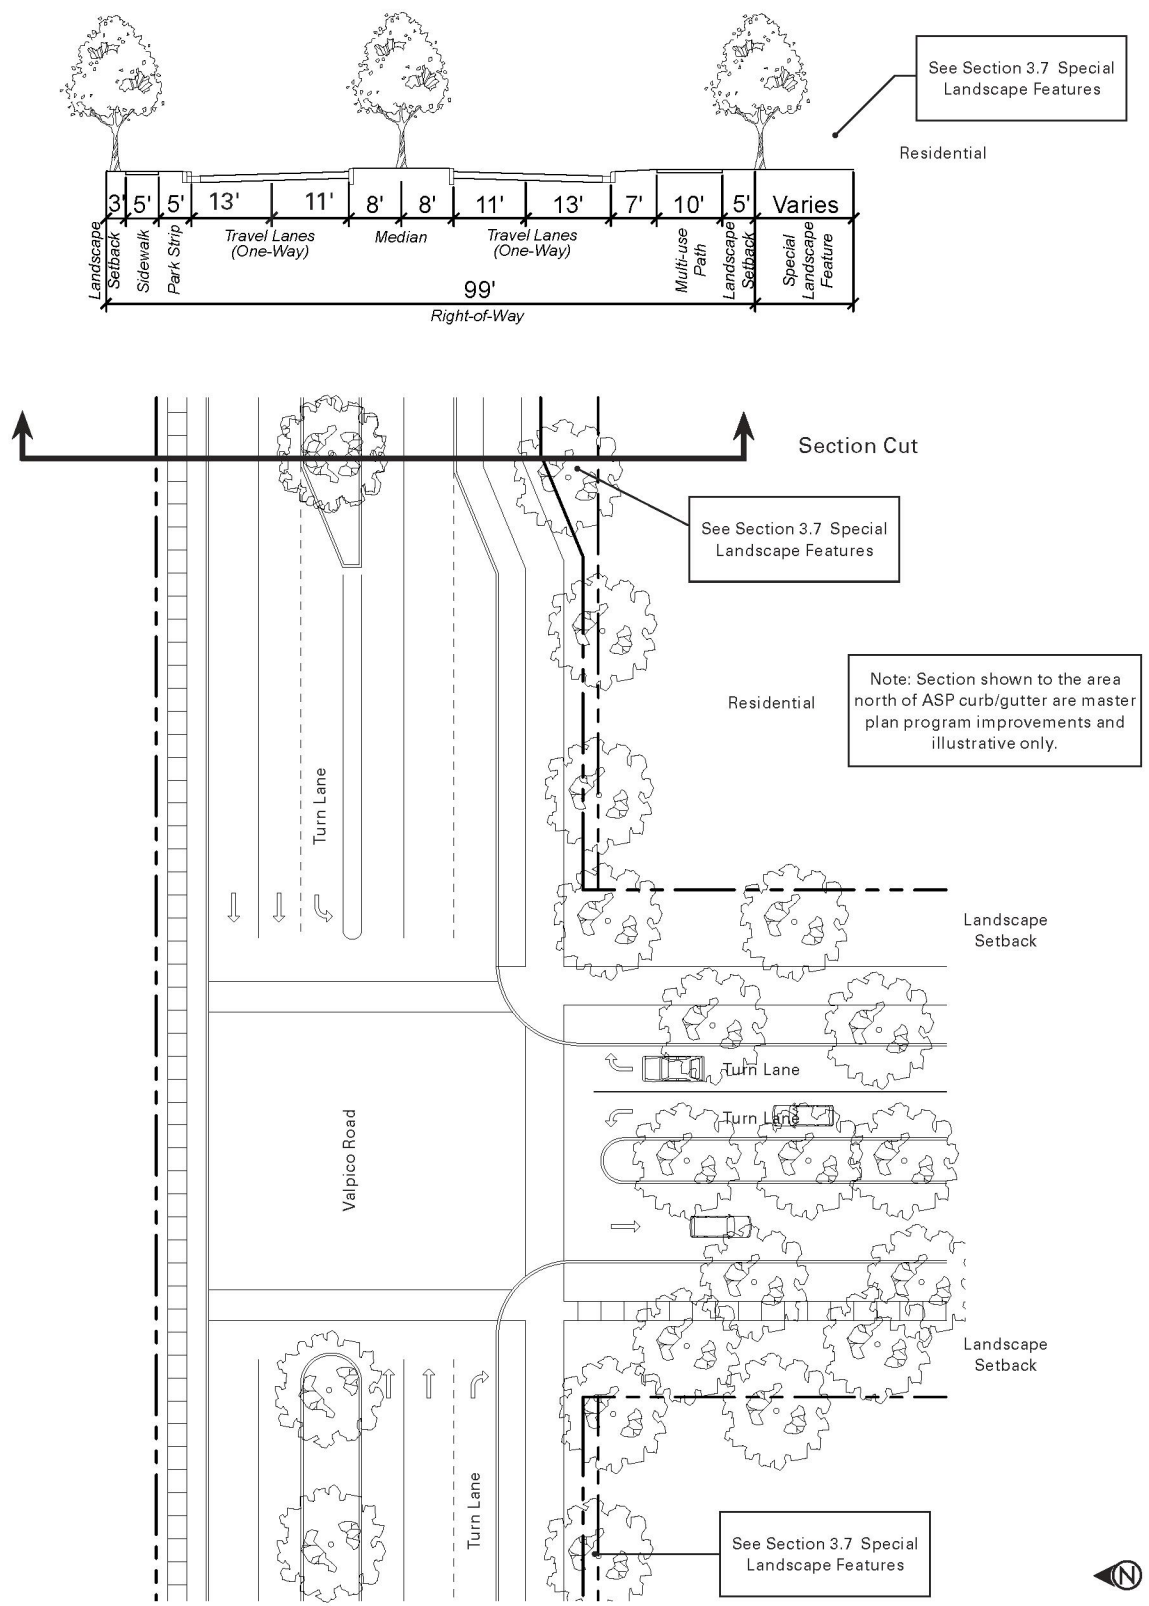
Section and Plan: Regional Arterial – Valpico Road, Designation A (Final Build-out)
